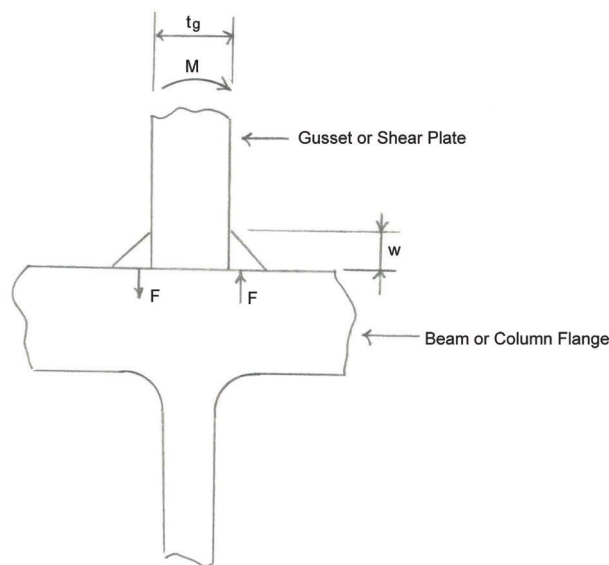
Section of Gusset or Shear Plate and Beam or Column
